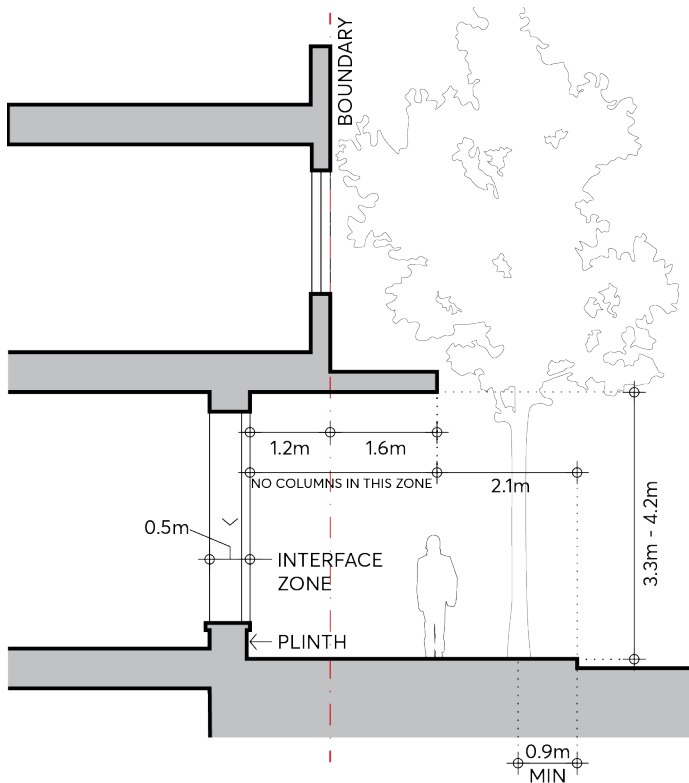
Street Section Aird St, O'Connell St and Campbell St
